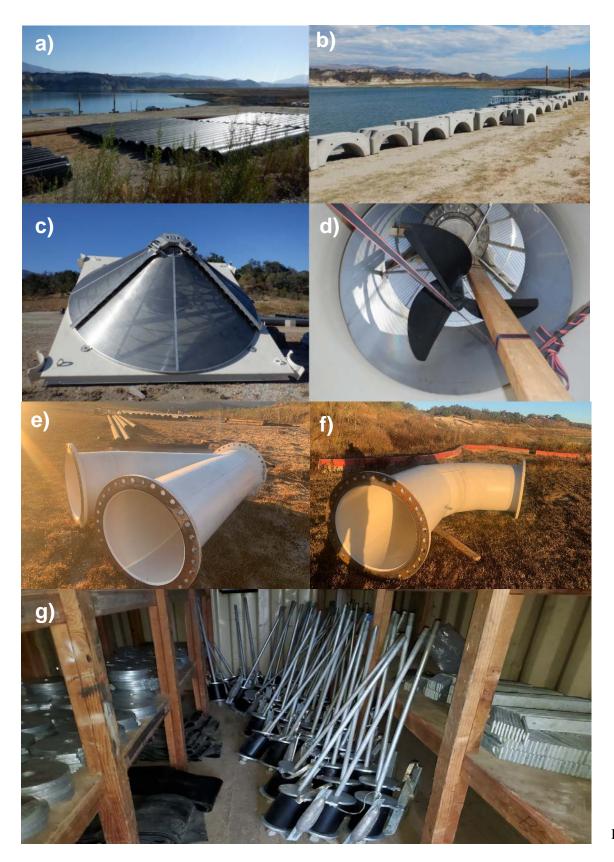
a) HDPE pipeline being fused, concrete weights installed, and being pushed out into the water; b) concrete anchor weights installed on pipeline
